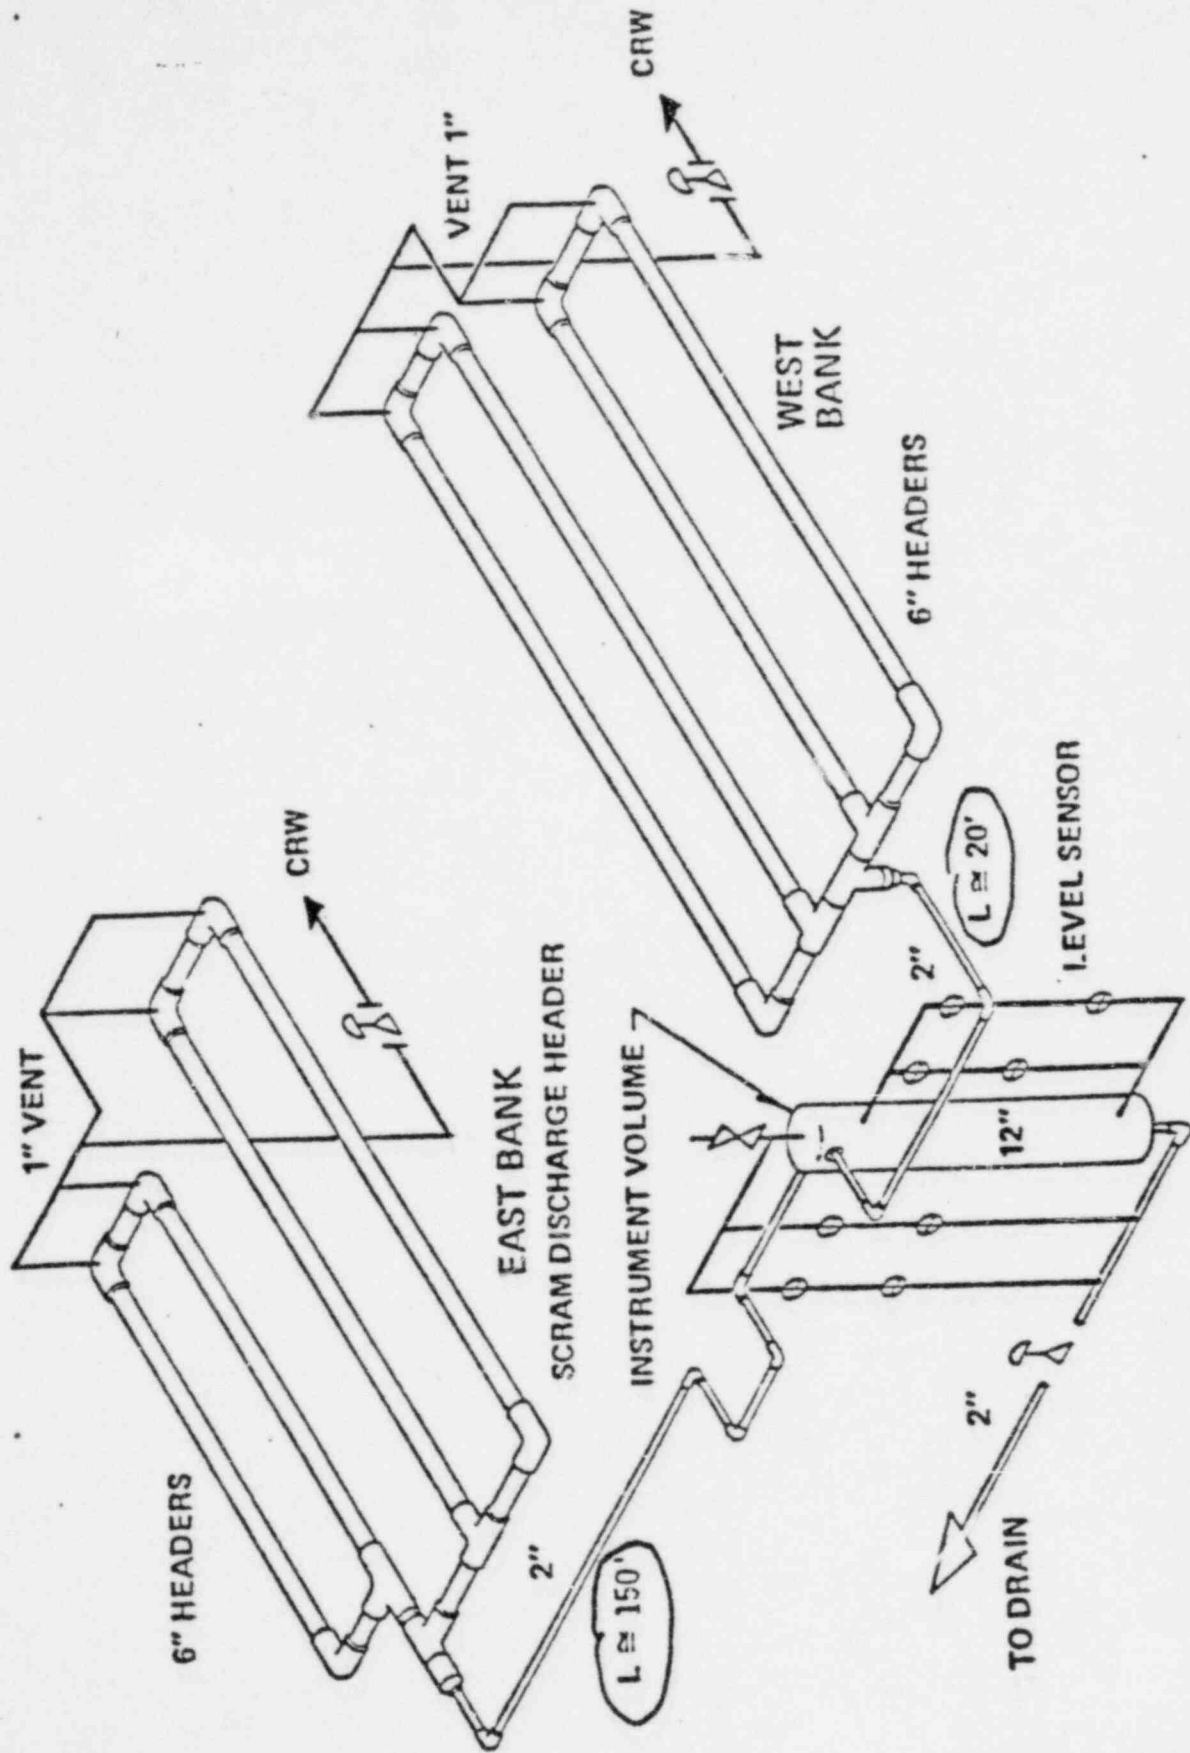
BROWNS FERRY SDV EQUIPMENT LAYOUT (ISOMETRIC VIEW)
